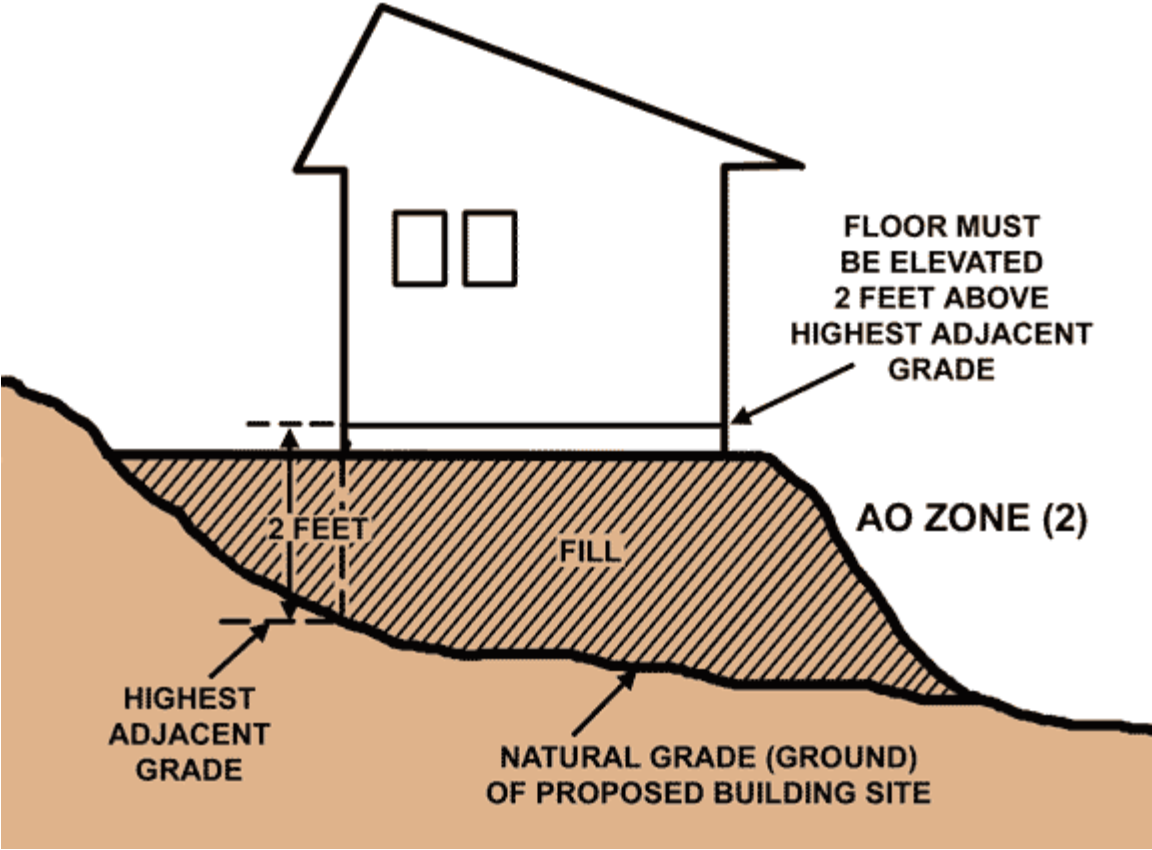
The illustration above shows two feet of fill being added to the highest adjacent grade at a proposed building site to allow the structure to meet elevation requirements for a structure in Zone AO, Depth 2.
